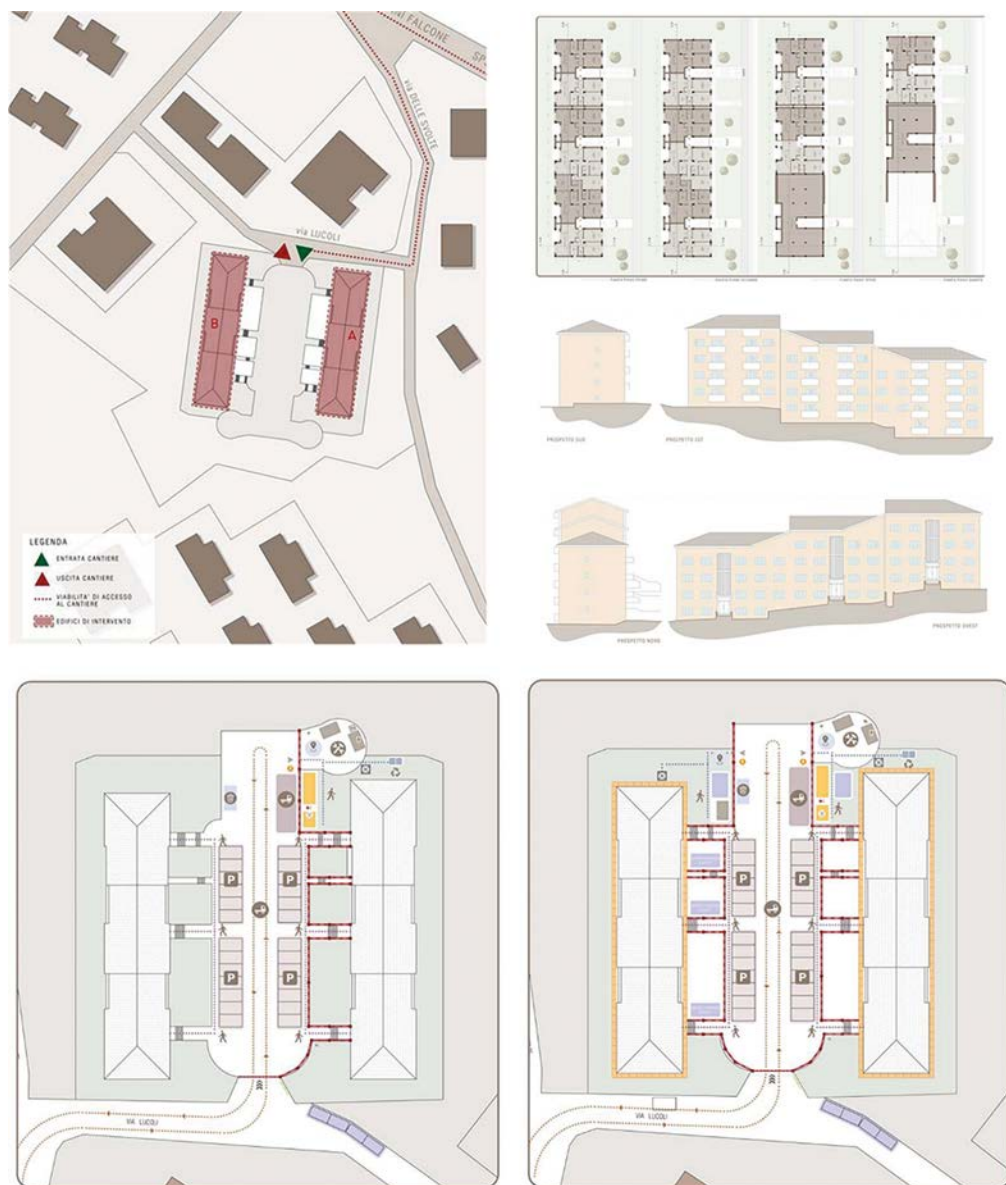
Top: location of buildings on the left, floor plans and elevations on the right. Bottom: construction site layout.
